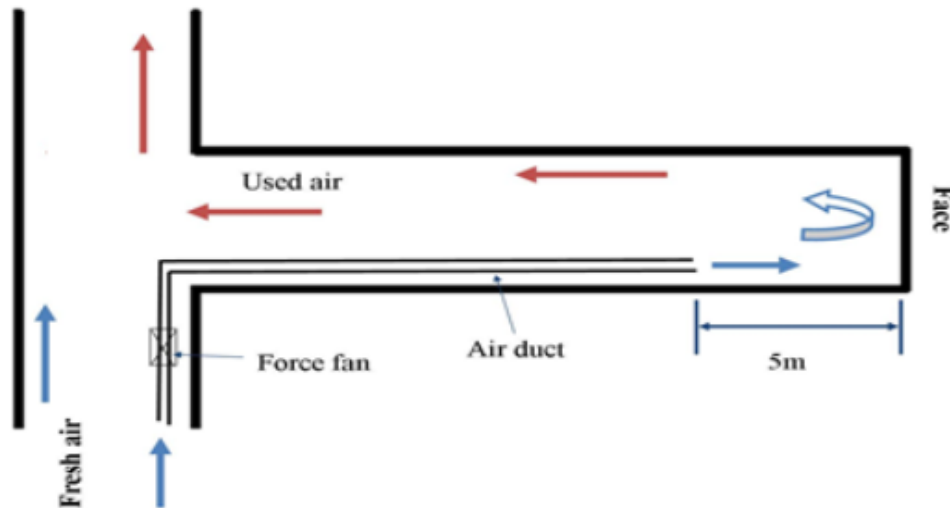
Force ventilation system (Burrows J. et Al, 1982)
